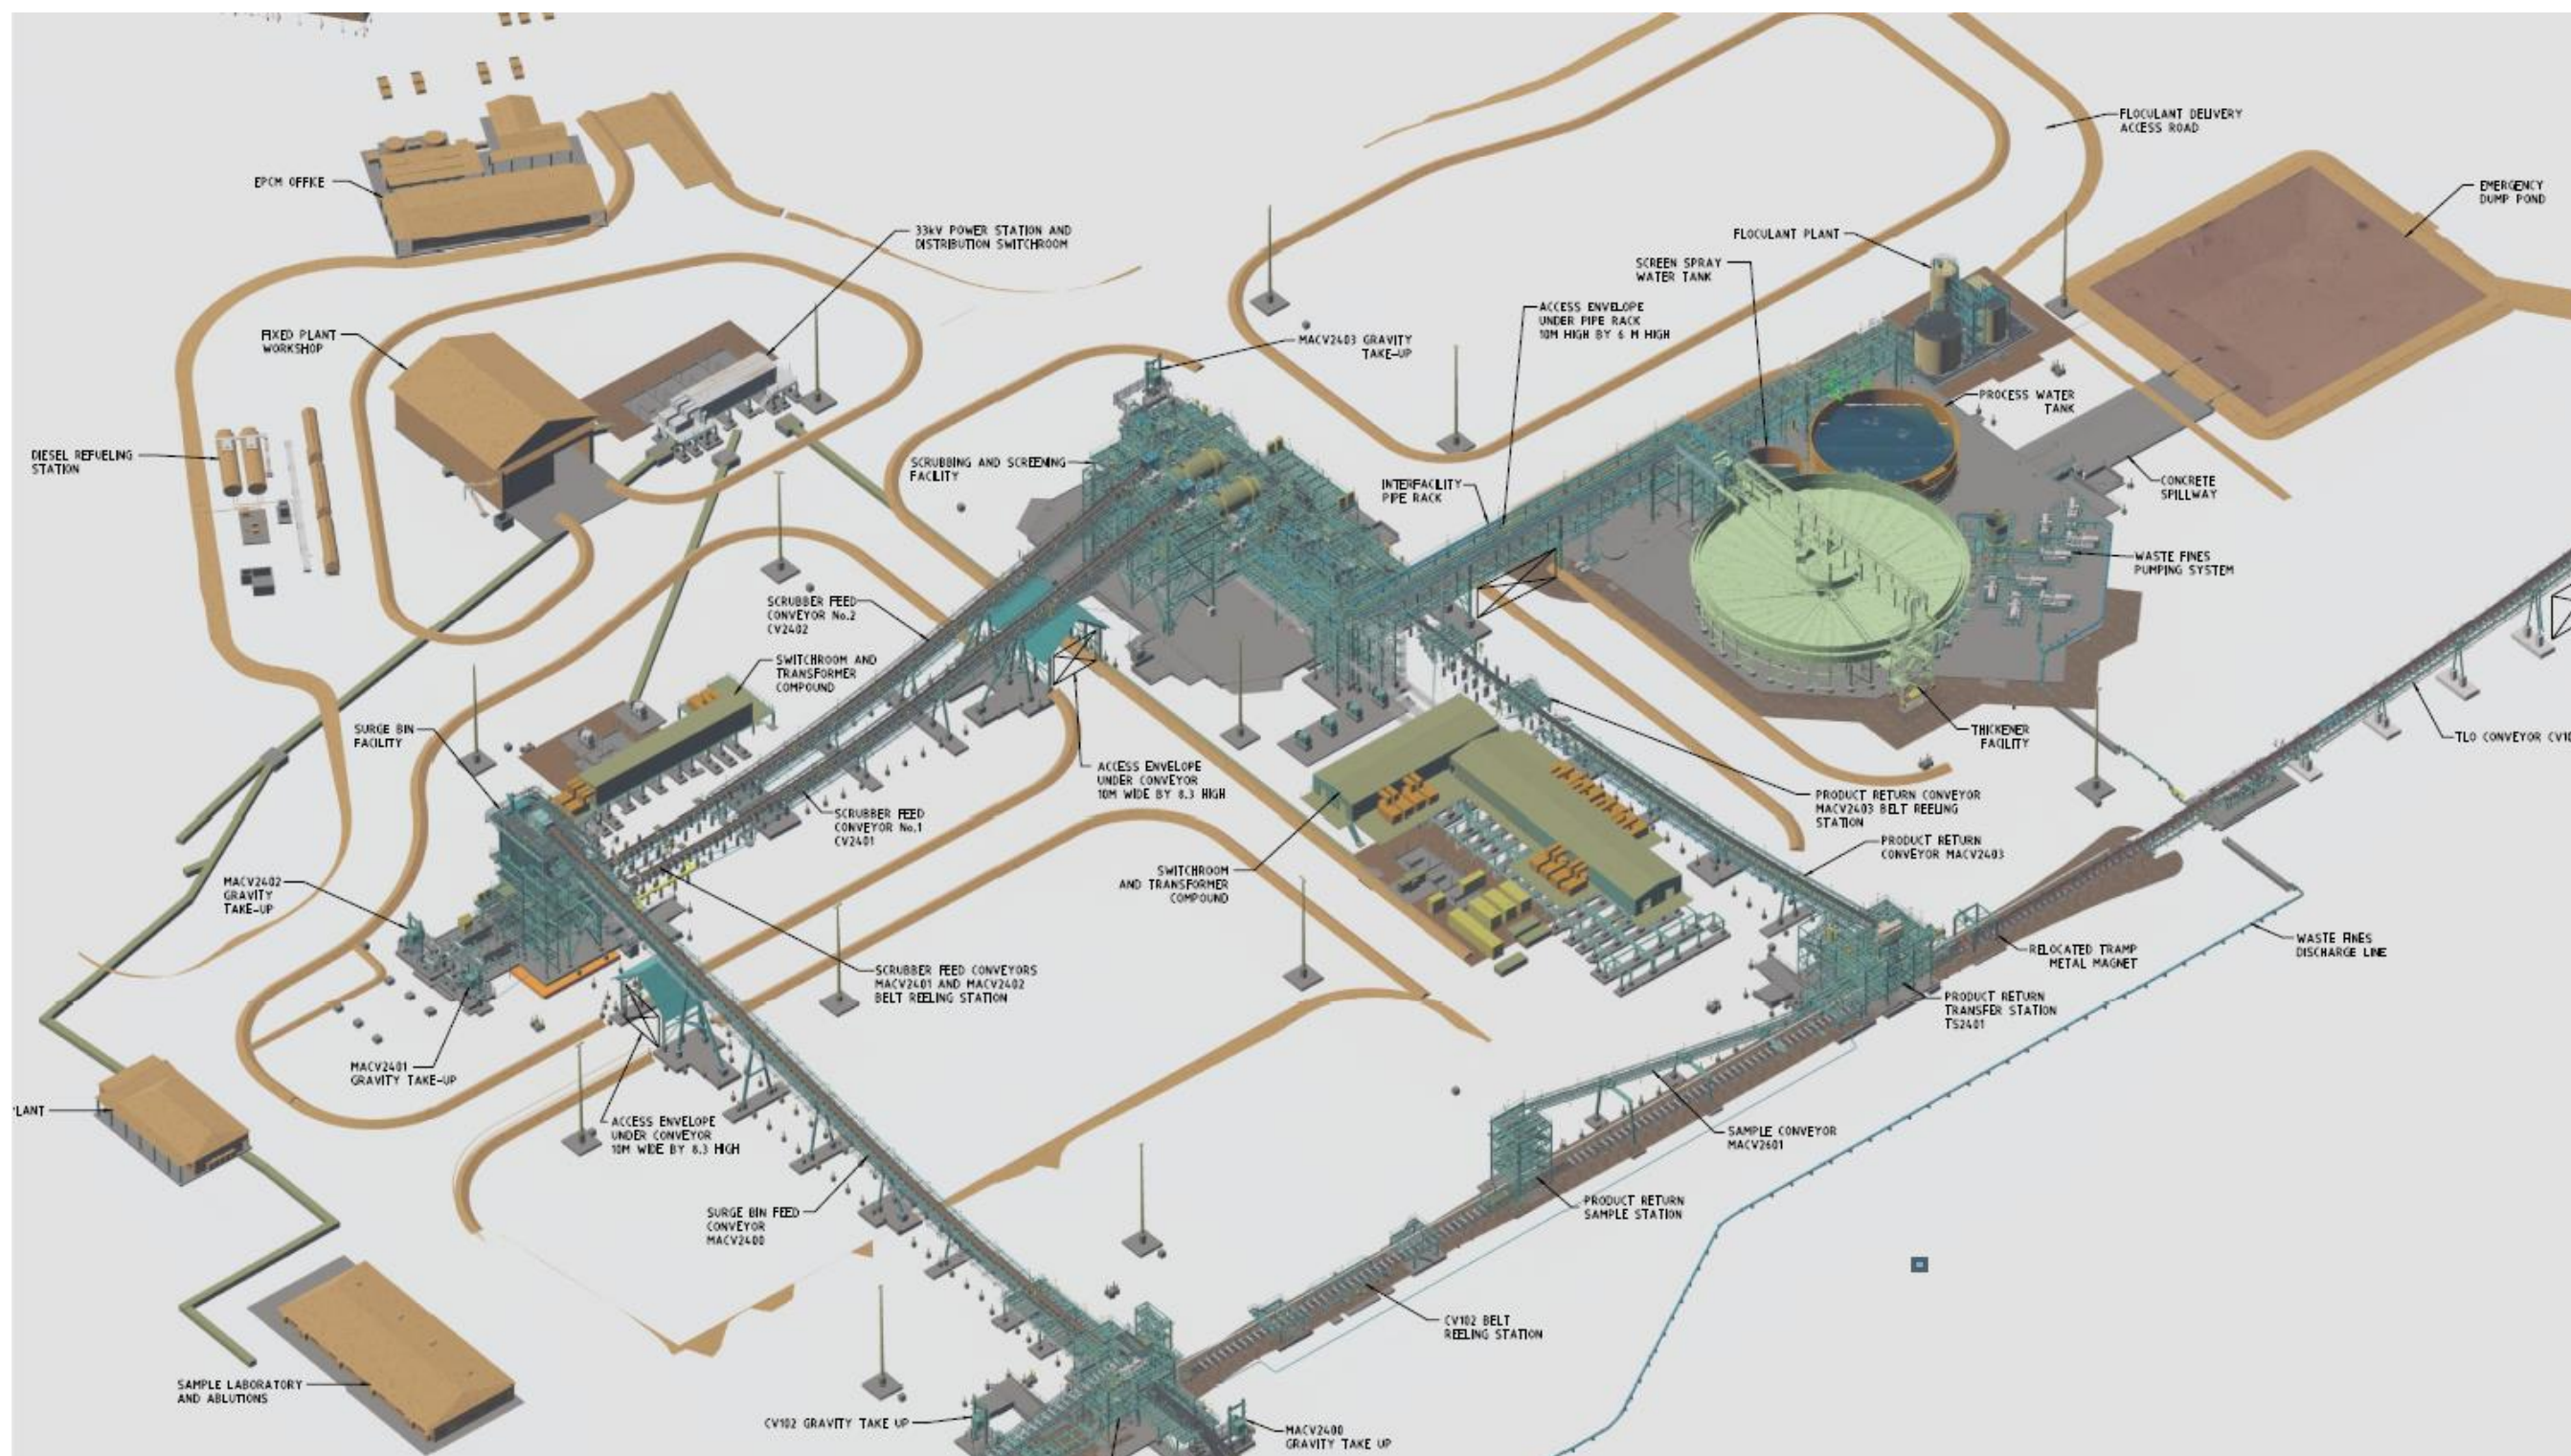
Site layout of the proposed ore processing facility (OPF) at Mesa A (concrete bunds and footings shown by grey shaded areas)
